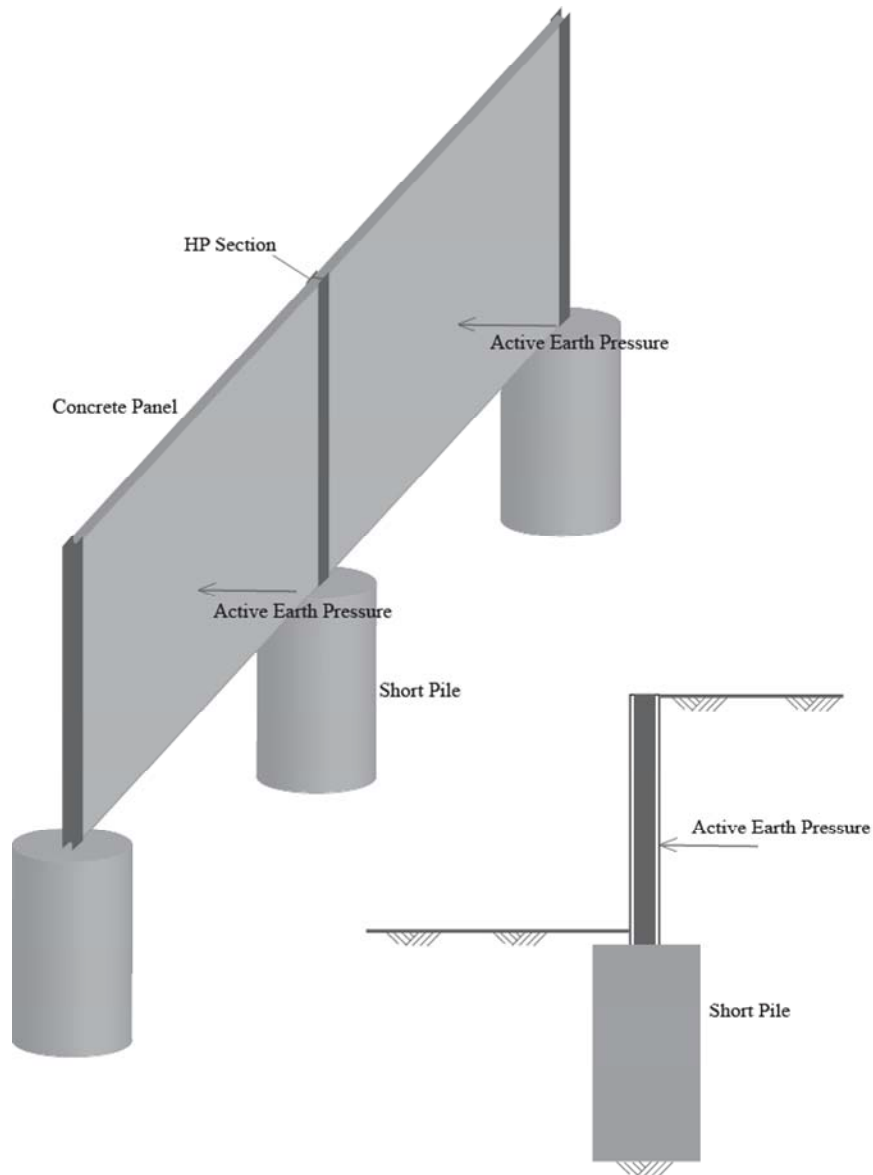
Post-and-Panel (Pile with Concrete Pier)
